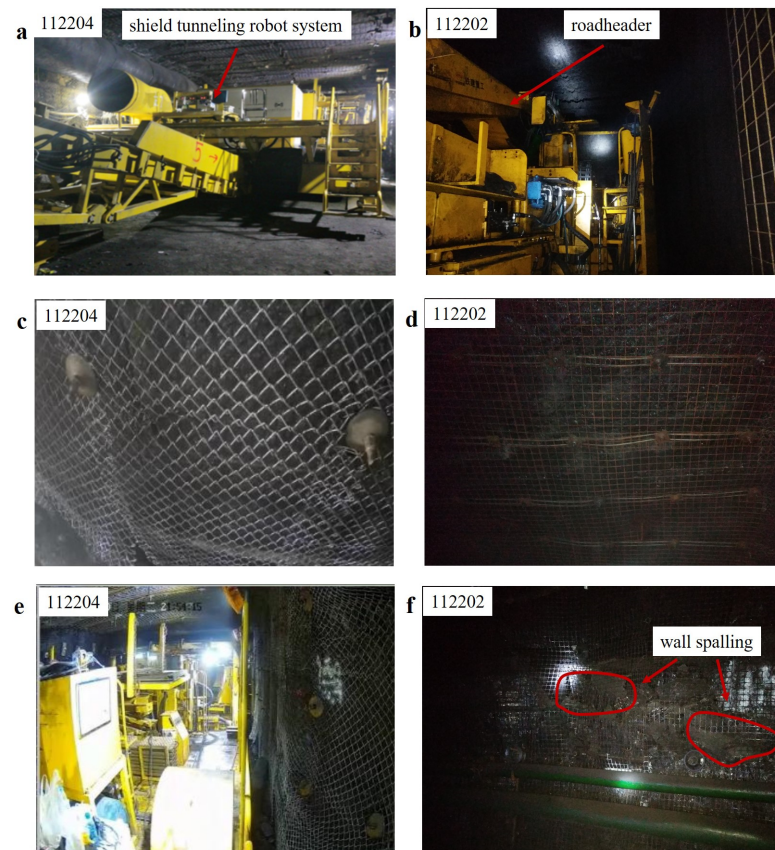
Tunneling face conditions. (a) Shield tunneling robot system. (b) Road header. (c) Tunnel 112204 face roof support condition. (d) Tunnel 112202 face roof support condition. (e) Tunnel 112204 face sidewall support conditions. (f) Tunnel 112202 face sidewall support conditions.
